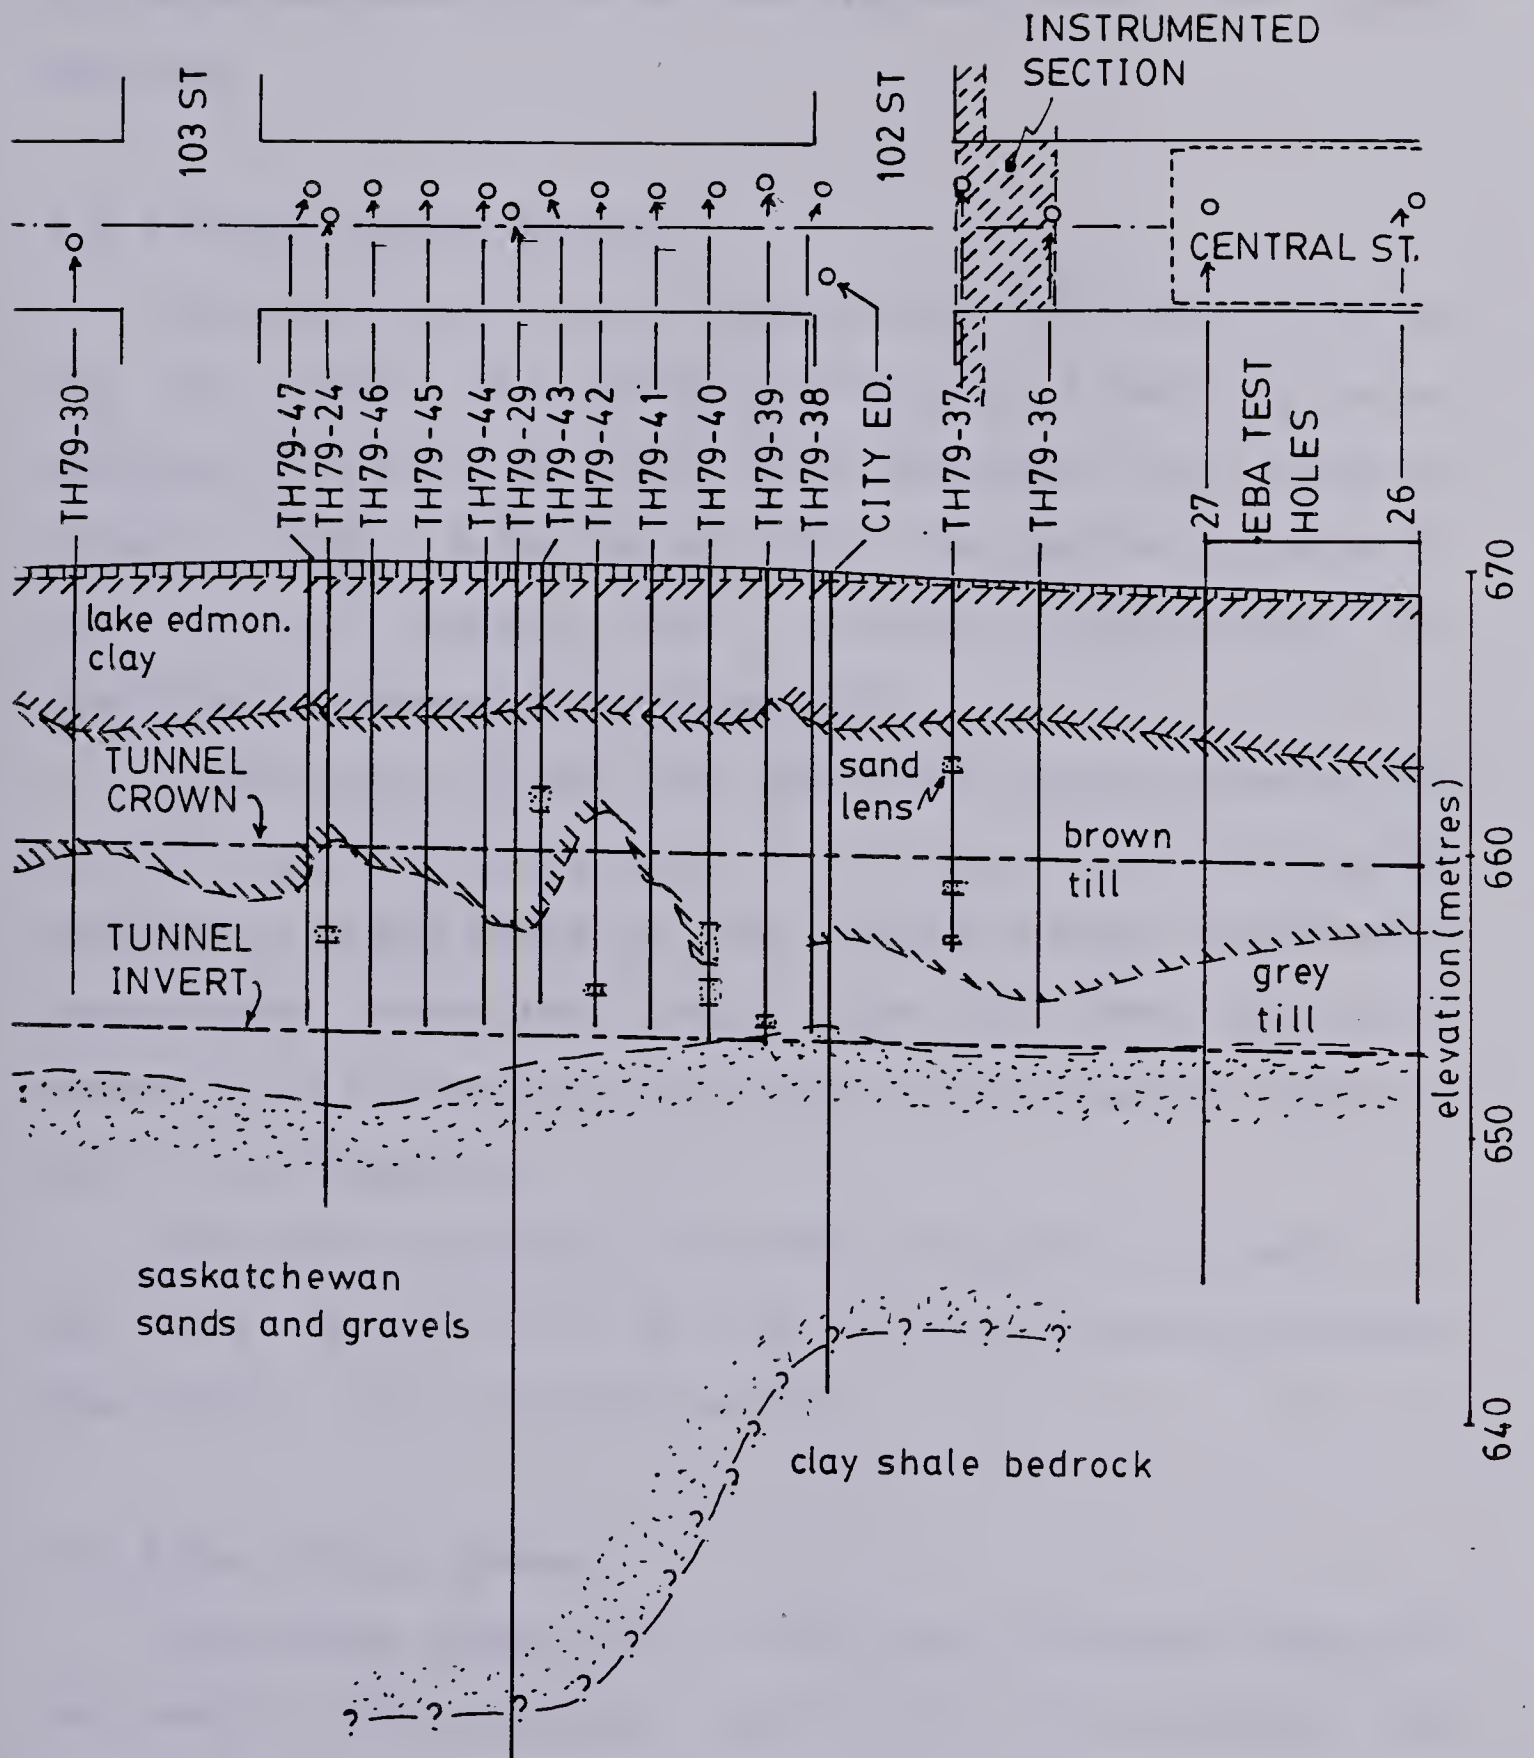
PLAN AND PROFILE FROM CENTRAL STATION TO 103 STREET (AFTER THURBER, 1980)
